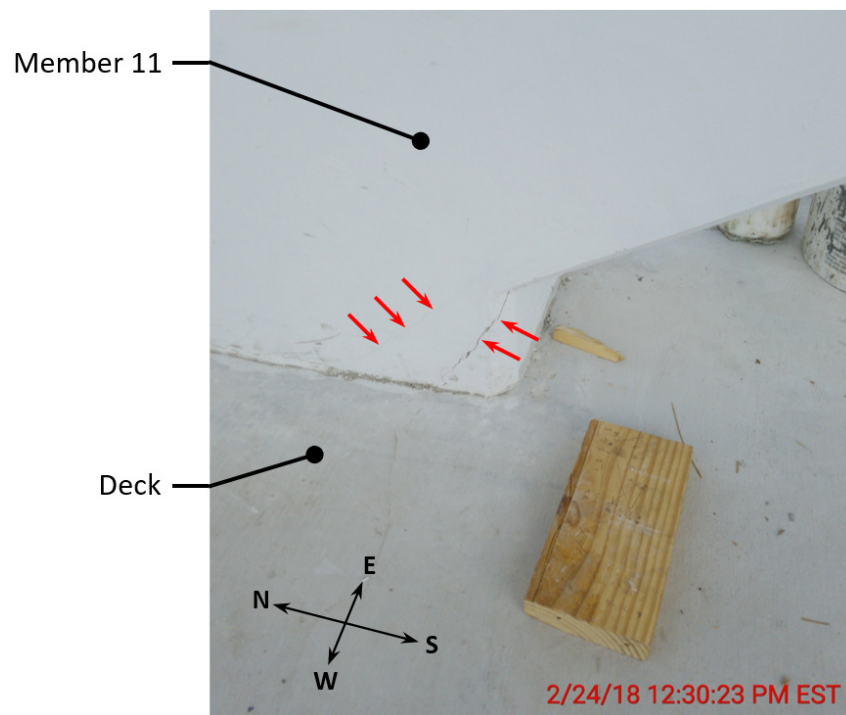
Photograph showing cracking at southwest corner of truss member 11 near where it met the deck. Captured on February 24, 2018 at 12:30 p.m. Corresponds to Bridge Factors Factual Report Photo 39.
